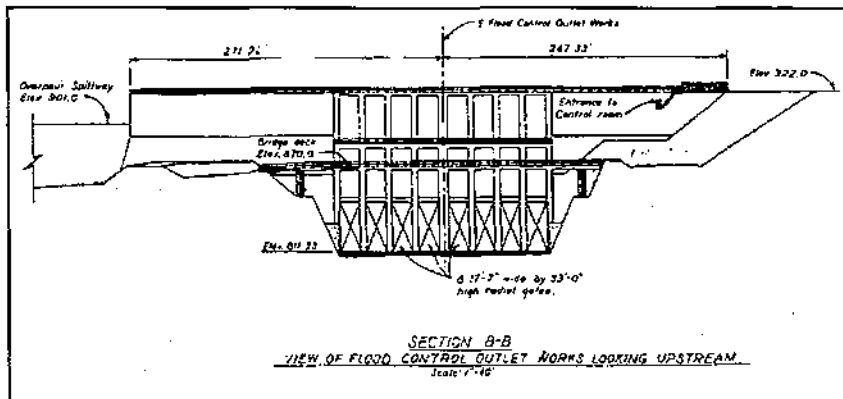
Sectional view looking upstream at main spillway with a small portion of the overpour spillway to the left.
